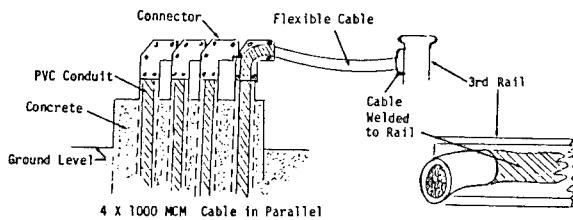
THIRD RAIL CONNECTION DETAILS
